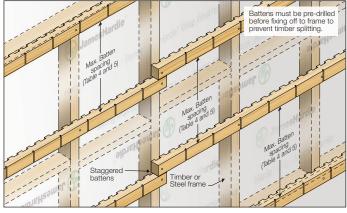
ON-STUD STAGGERED JOINTING OF BATTENS
